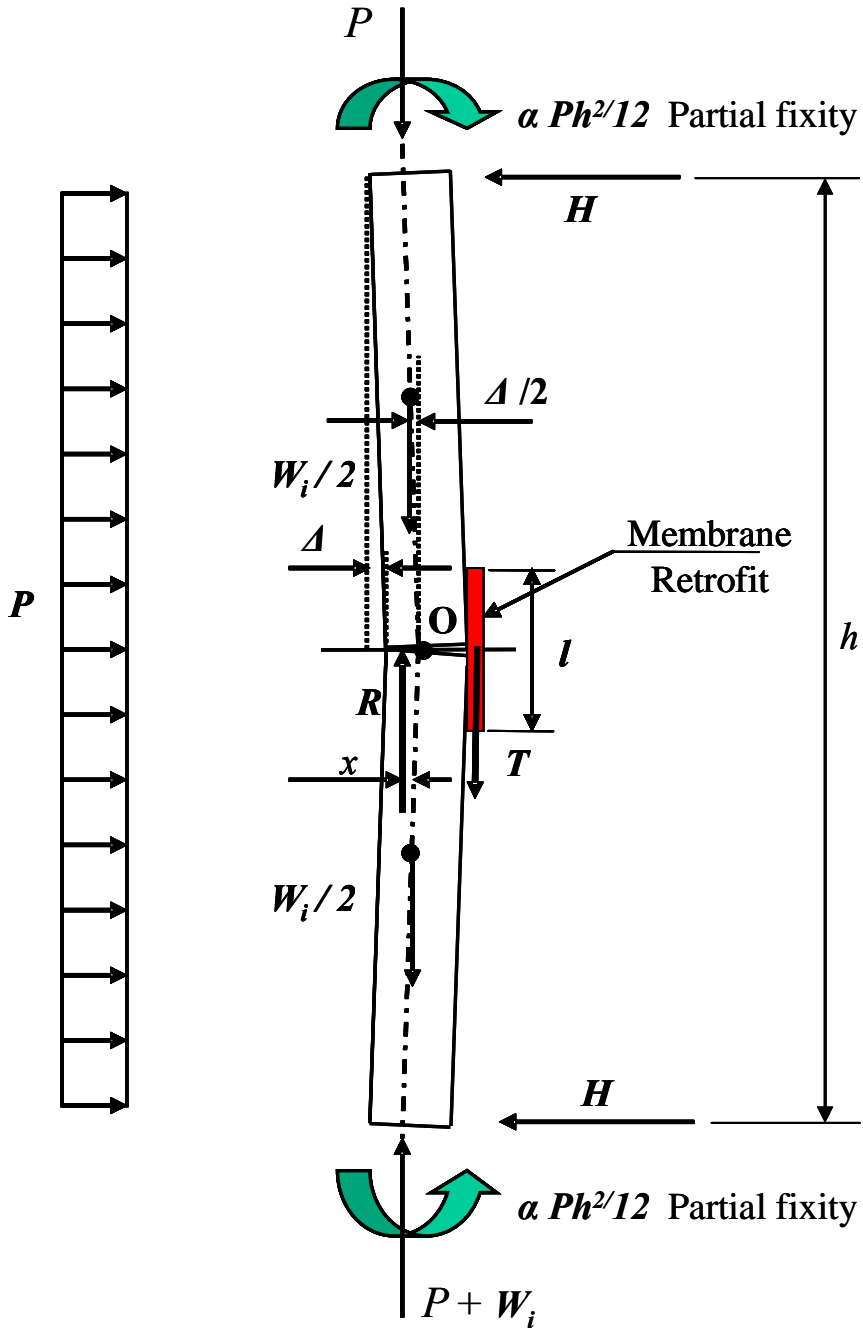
Free-body diagram of polymer retrofit concrete masonry wall
